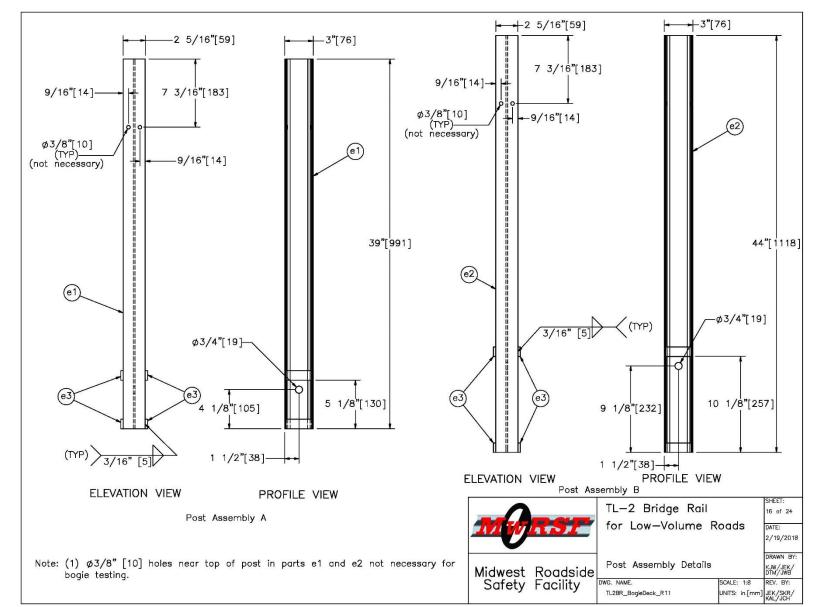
Bogie Testing Matrix and Setup, Post Assembly Details
